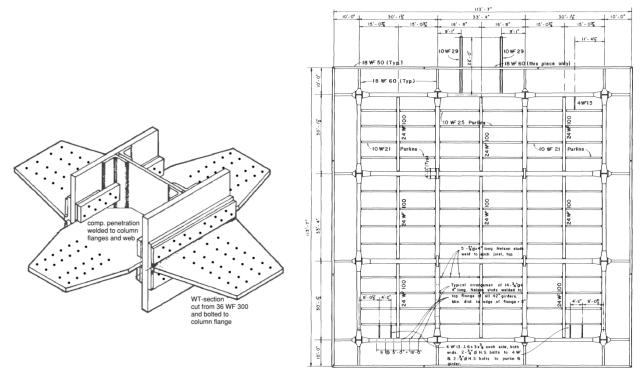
Typical beam-column connection. From Rea et al. (1966)
